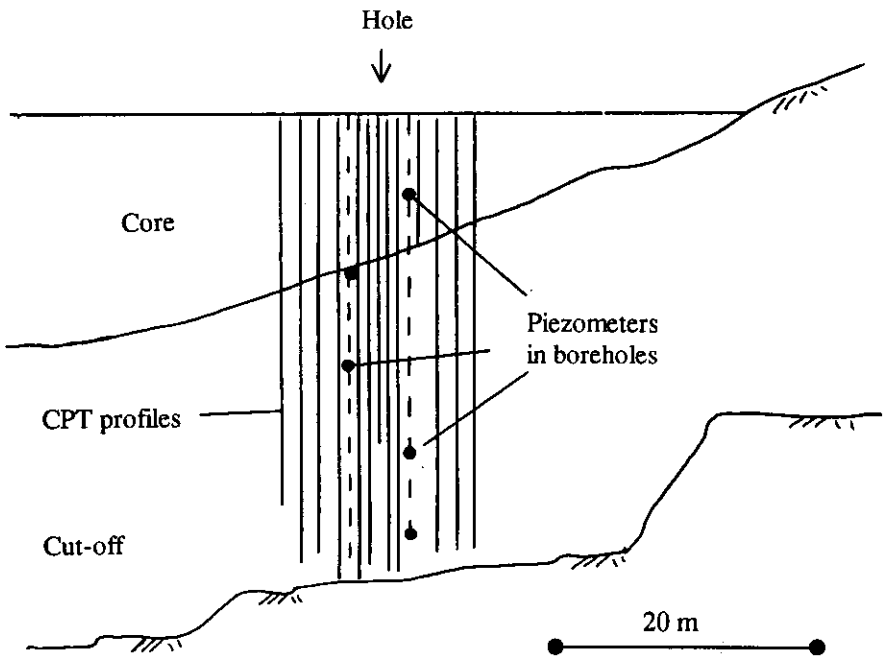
Longitudinal section showing location of CPT and piezometers in the core and the cut-off trench
